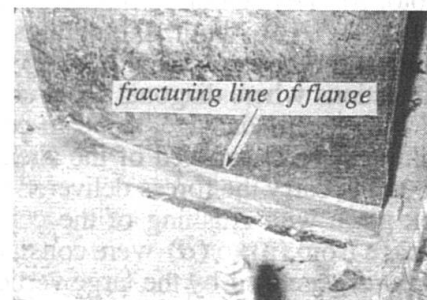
Fracturing of Column Steel Flange Plate (after chipping concrete)
